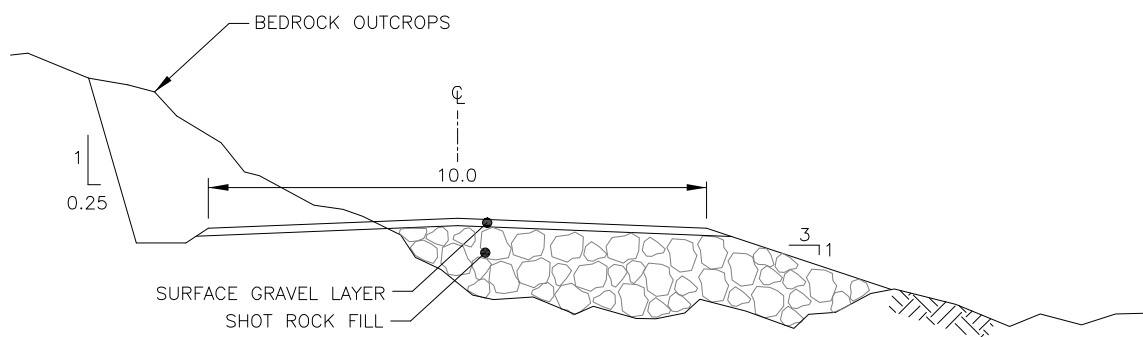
Typical Road Cross Section on Bedrock (Terrain Type 5)
